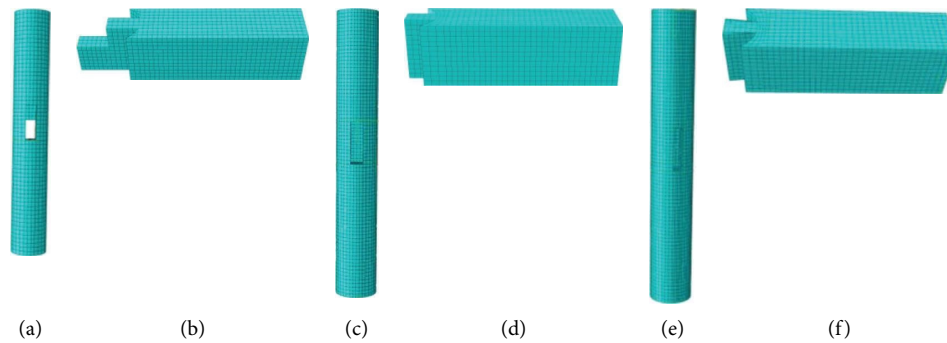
Element meshing: (a) Tou mortise-tenon column. (b) Tou mortise-tenon beam. (c) Ban mortise-tenon column. (d) Ban mortise-tenon beam. (e) Dovetail mortise-tenon column. (f) Dovetail mortise-tenon beam.
